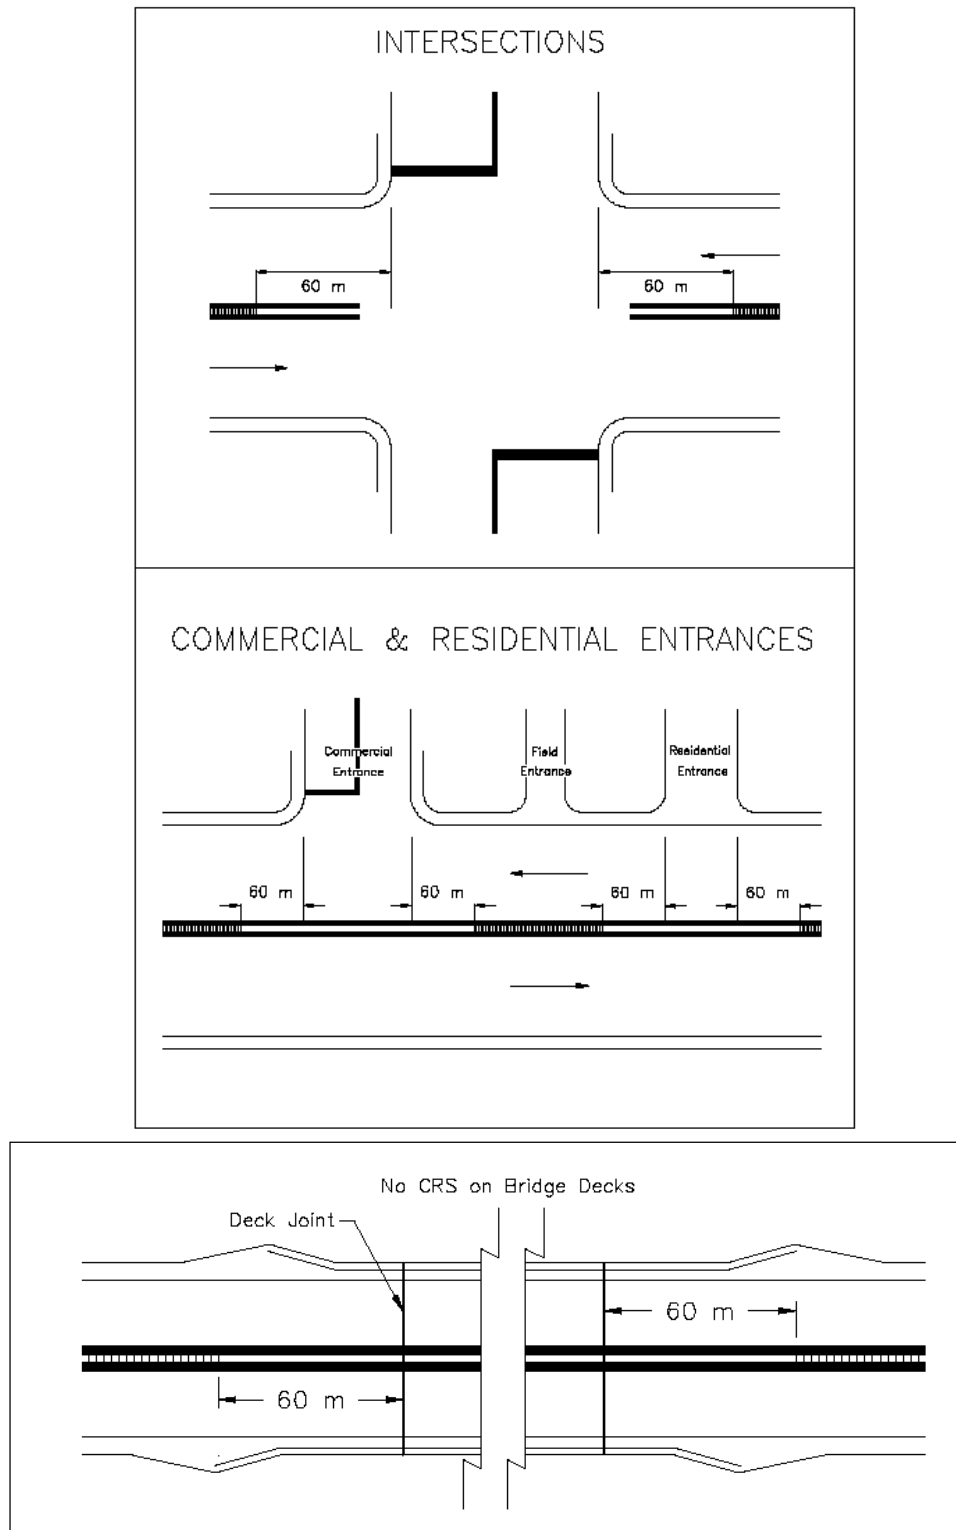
British Columbia CLRS Interruptions at Intersections, Driveways, and Bridge Decks (5)
